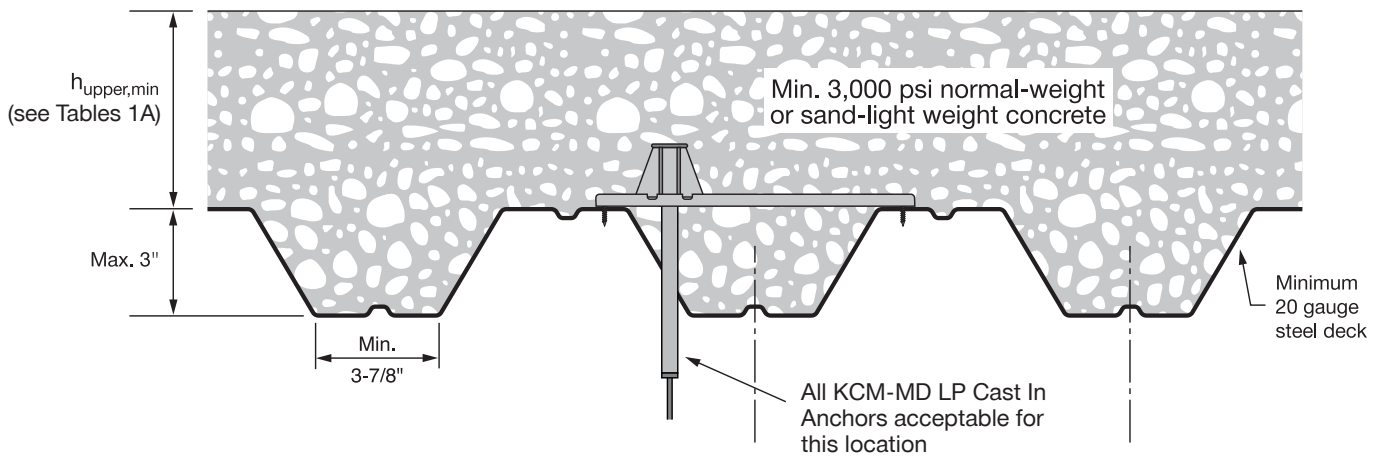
D — Installation in the soffit of concrete filled metal deck floor and roof assemblies-over flute incline (W-deck)
